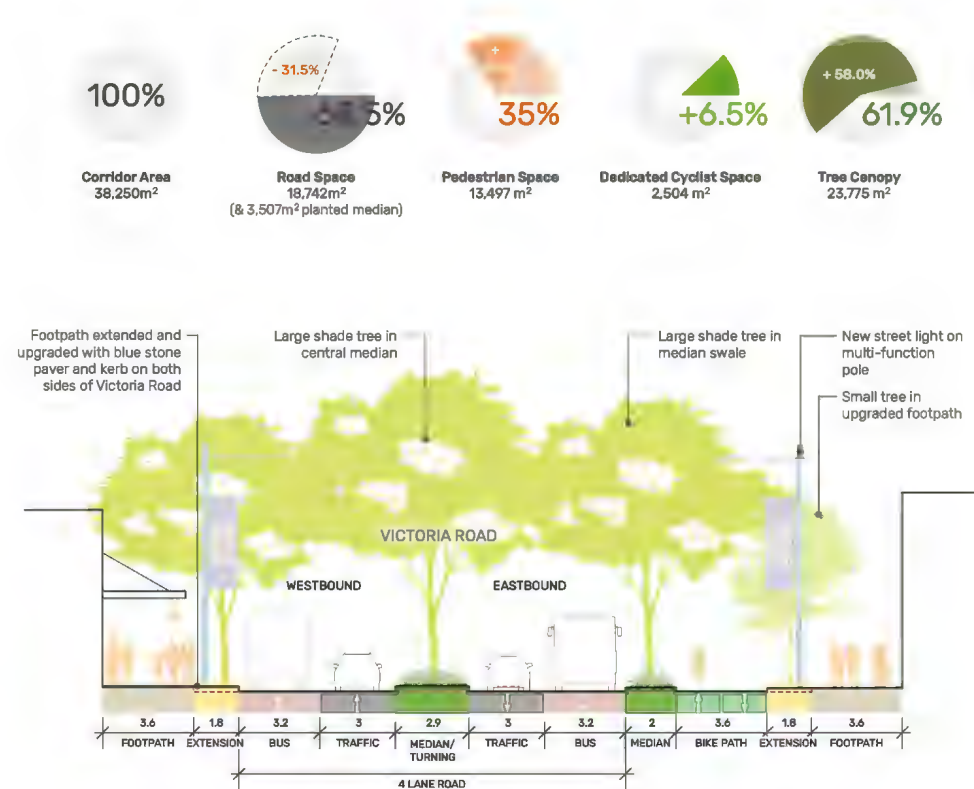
Victoria Road Section (1:200) Typical Proposed Configuration
